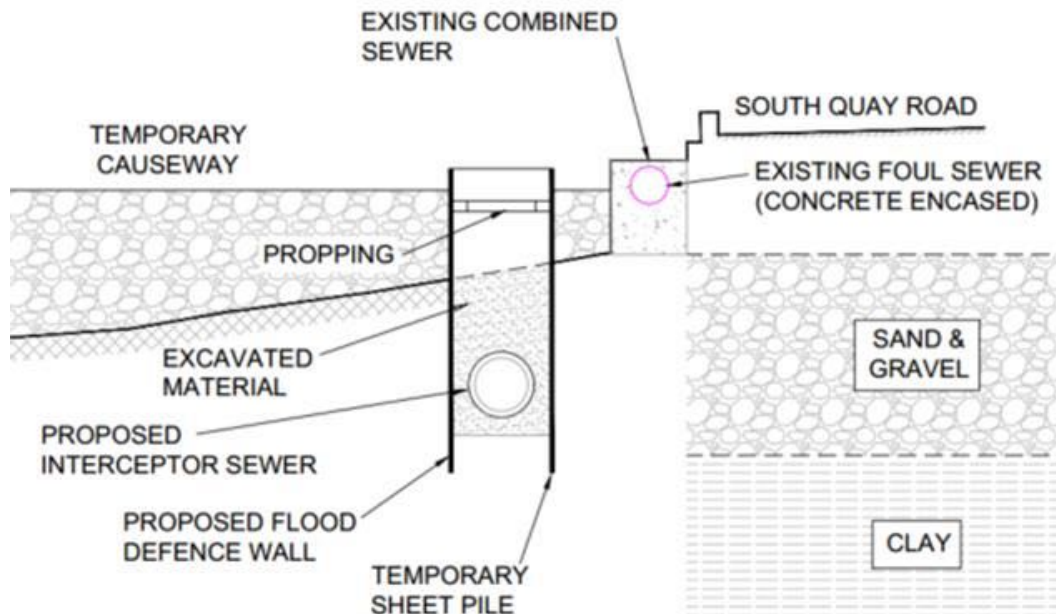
Overview of proposed open cut construction of the river based sewers
